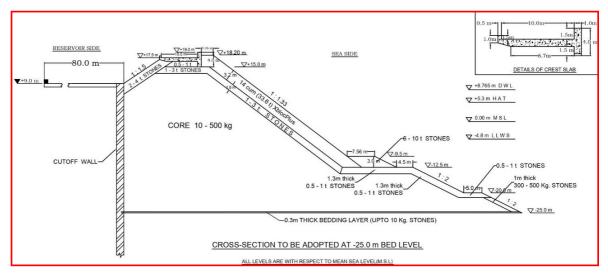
Cross-section of sea dyke with XblocPlus armour units at -25 m bed level for the proposed dam of Kalpasar Project, Gujarat
